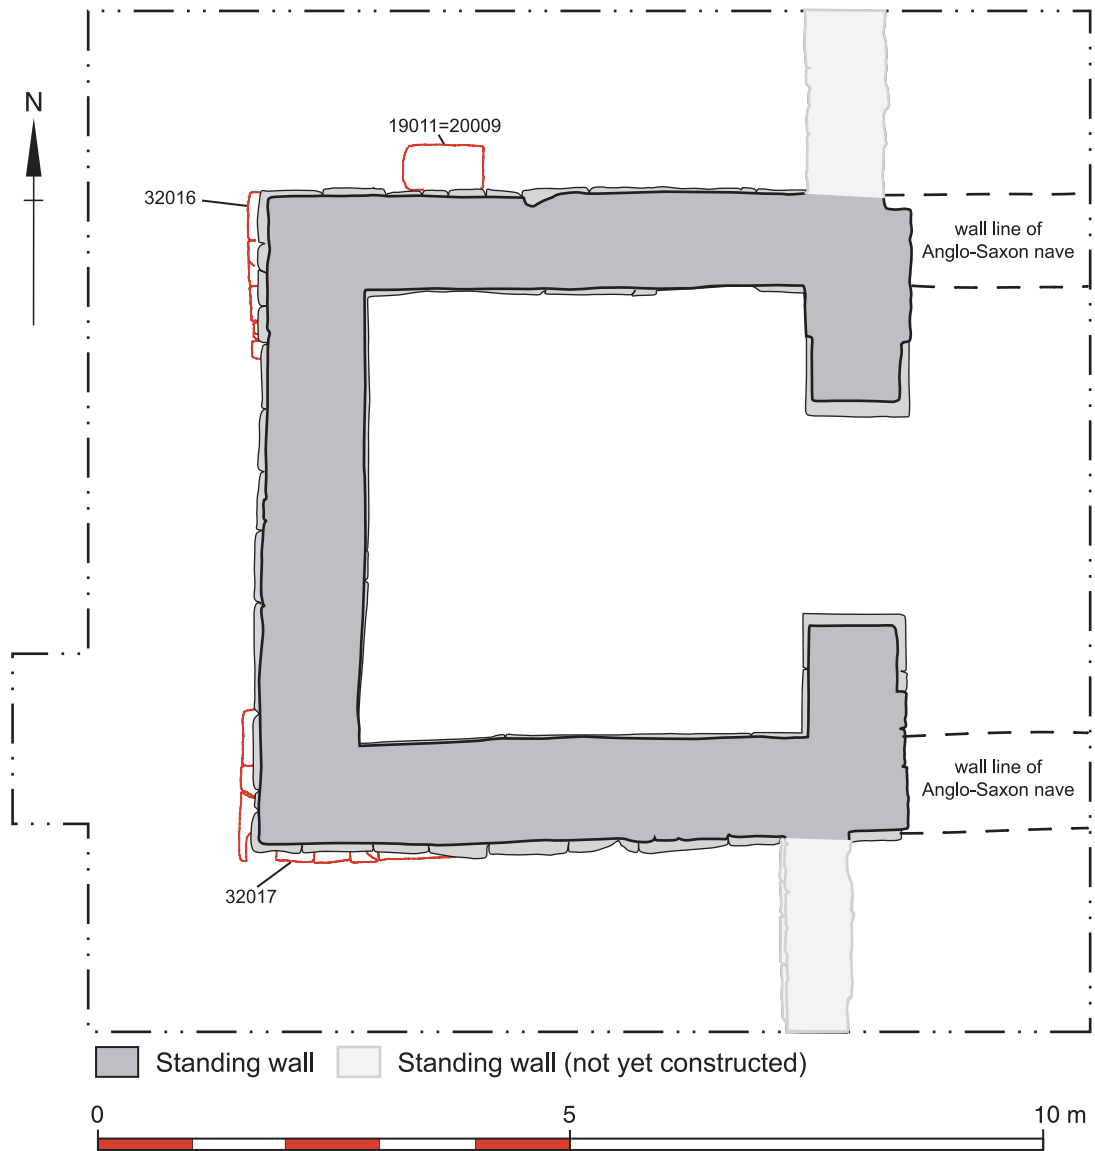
Construction of the standing tower (Trench 2). Scale 1:80
